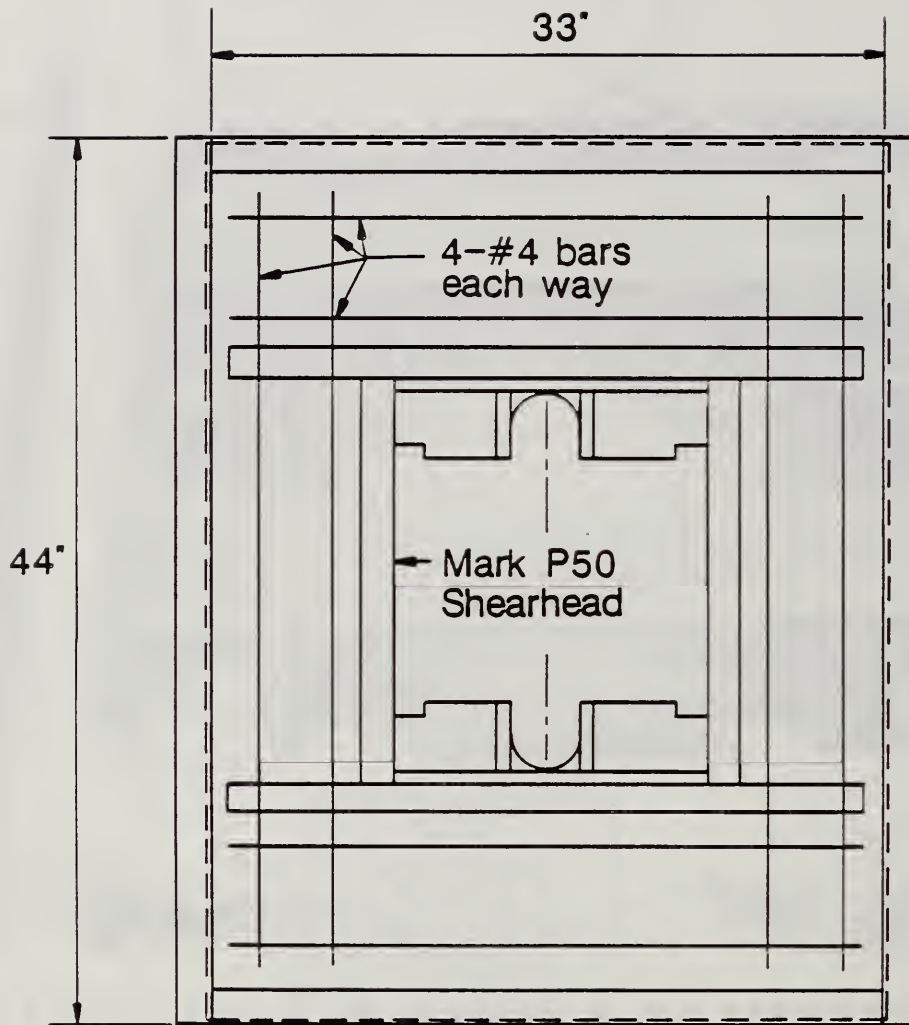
Shearhead configuration used in lifting assembly tests 4 and 5
